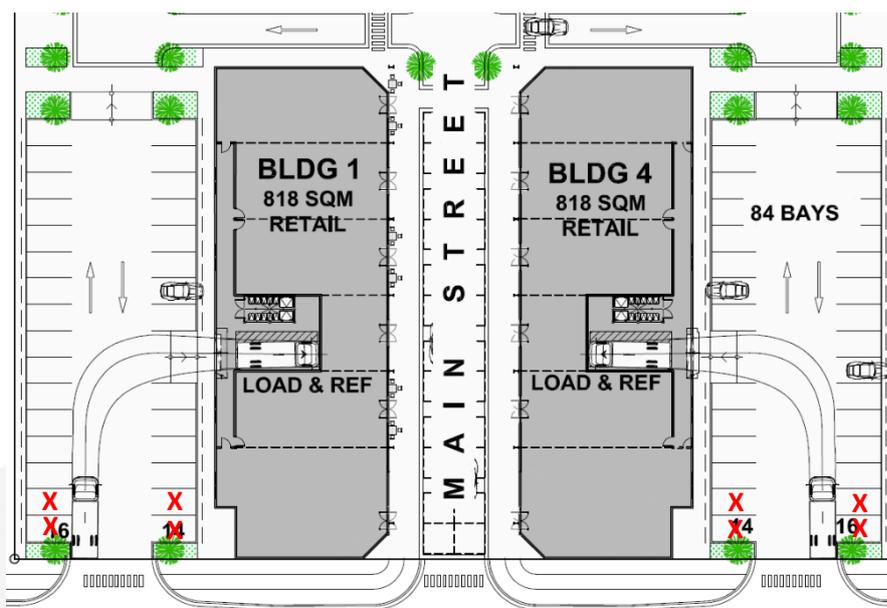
Parking Spaces to be Removed to Create Queuing Space
